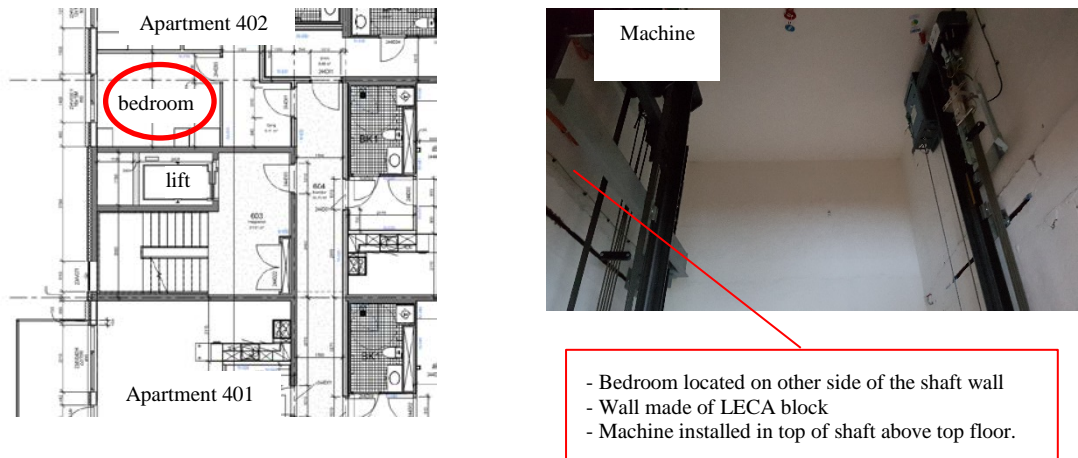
Excerpts from floor plan for the one case study (left). Photo from inside lift shaft (right)
